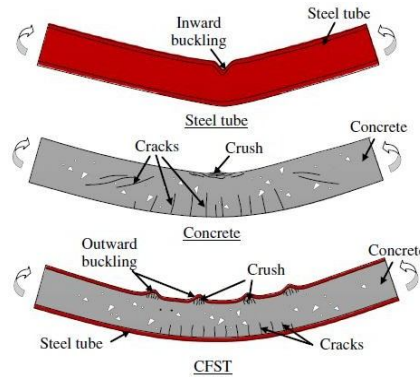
Failure modes of steel tube, RC member & CFST under bending
